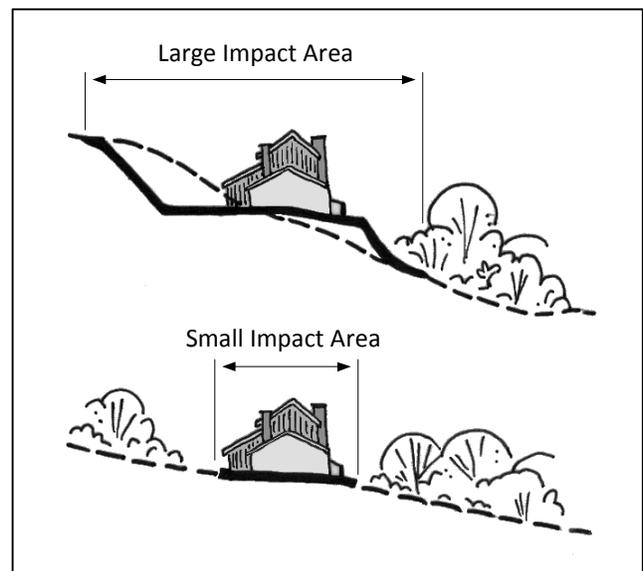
Flattening Steep Slopes for Building Sites Uses More Land Area Than Building on Flatter Slopes
